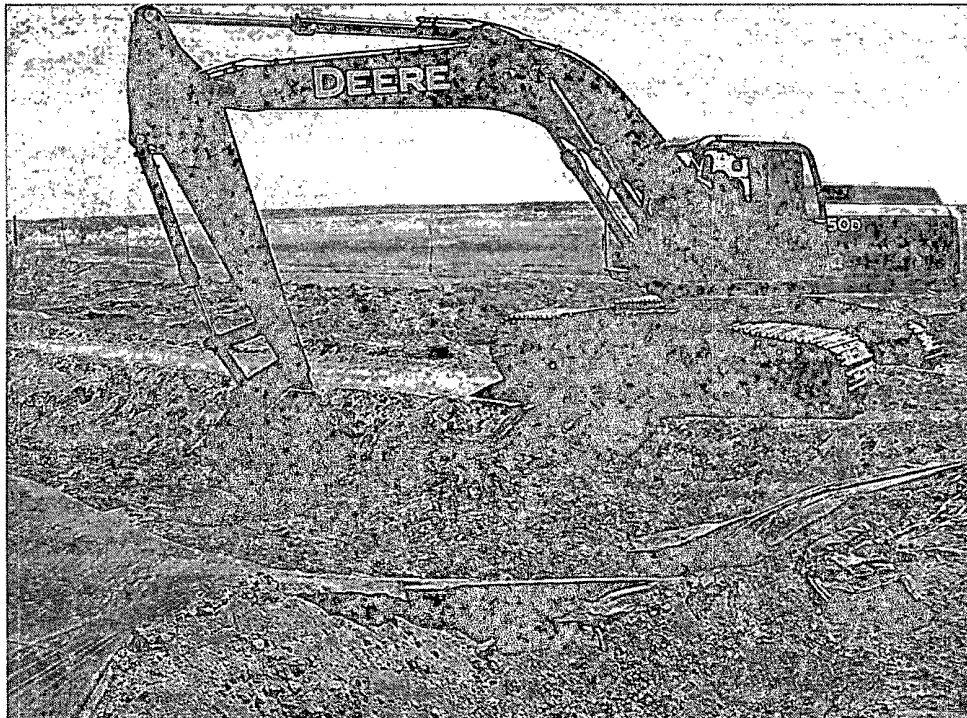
Removing sludge from the east side of the pit (looking northeast).
